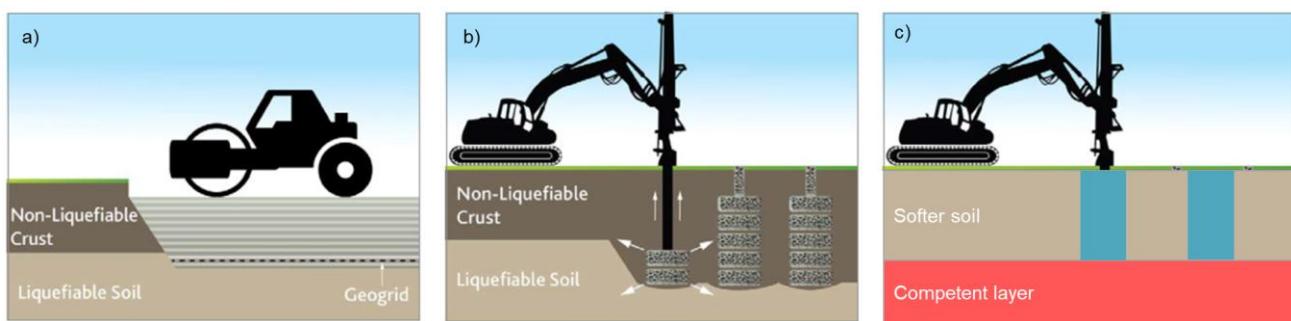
Examples of ground improvement options to facilitate rocking foundation design, including (a) reinforced gravel raft, (b) stone columns, (c) stiff inclusions (e.g. piles) to a competent layer (after NZGS/MBIE Module 5, 2021).
